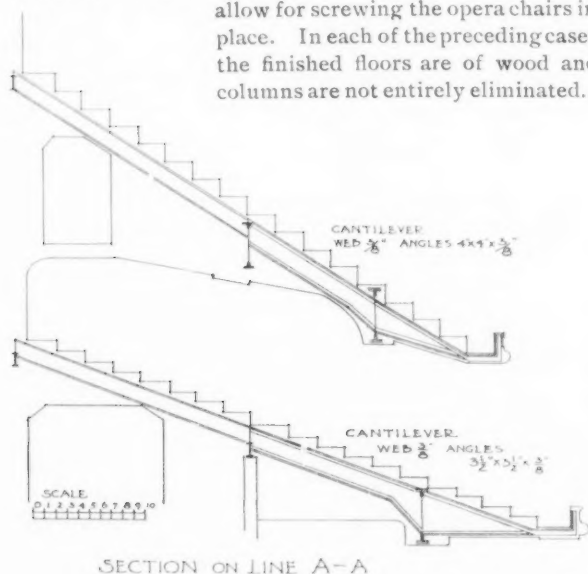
BALCONY CONSTRUCTION, NEW LYCEUM THEATER, BOSTON.
